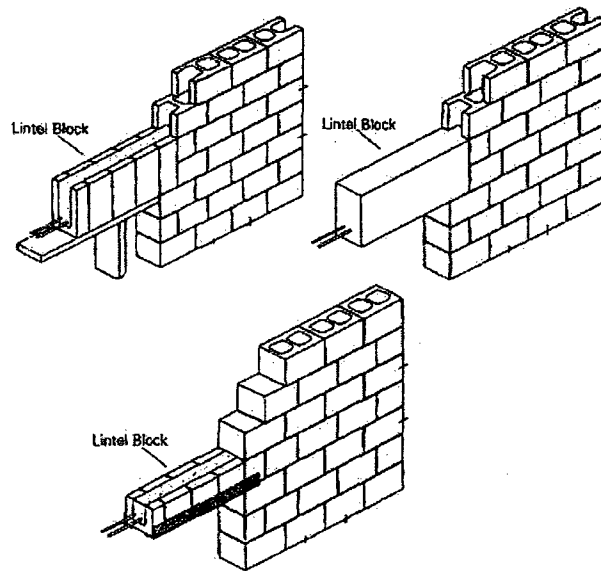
Reinforced concrete lintel masonry units supporting opening located in an unreinforced masonry wall (Taly, 2001)
